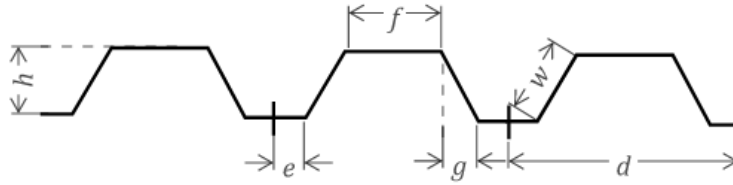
Cross-sectional deck profiles for the welded specimens
